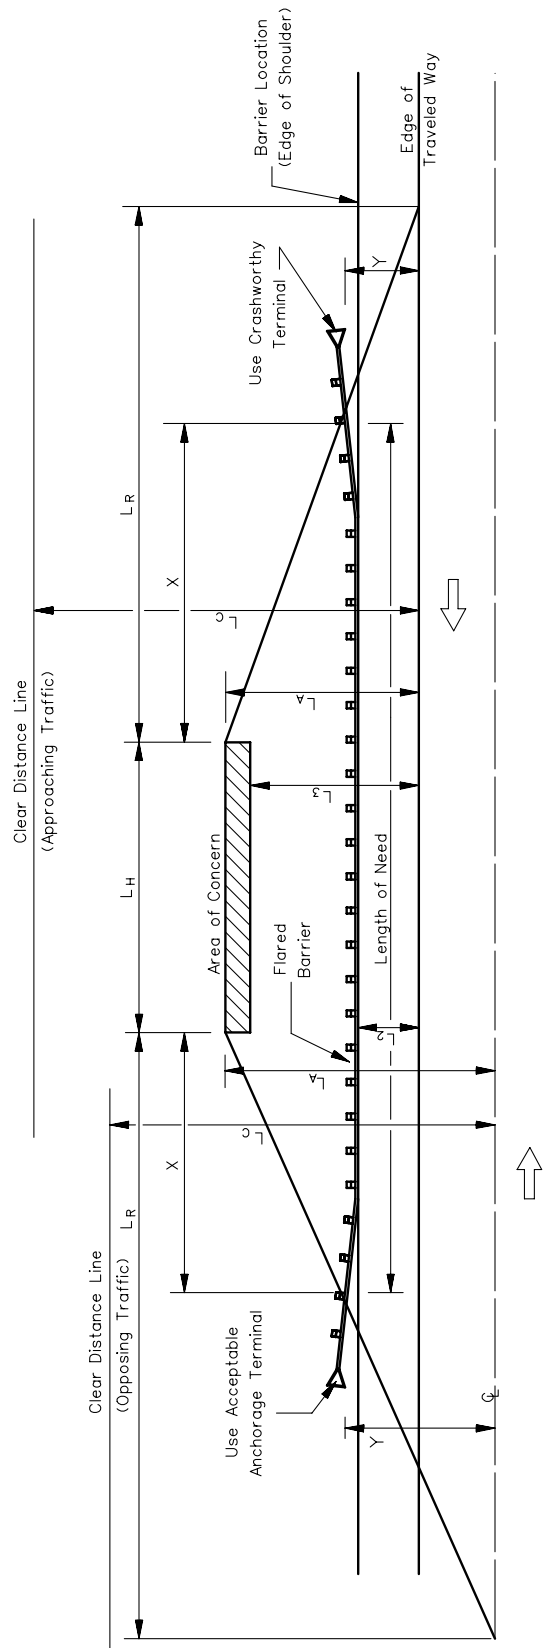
E GUARDRAIL LENGTHS REQUIREMENTS
